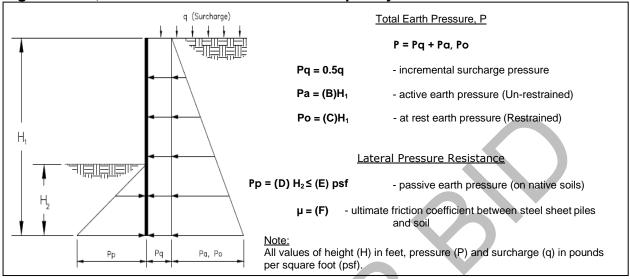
, Lateral Earth Pressures for Temporary Braced Excavation
